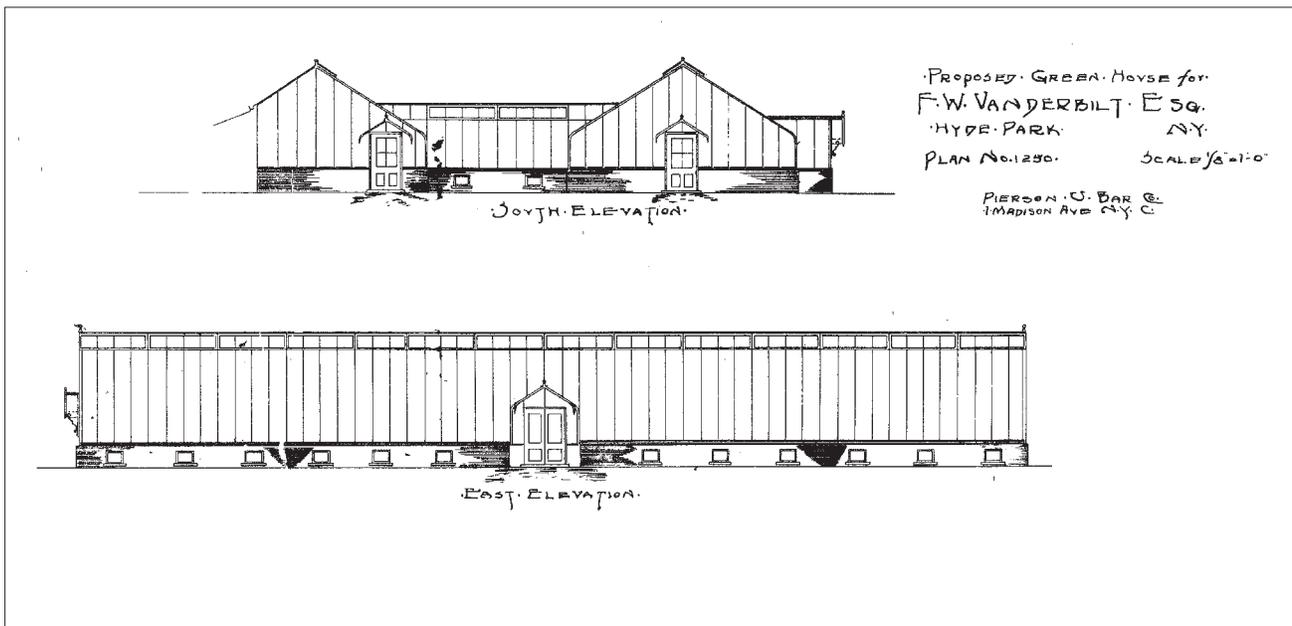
"Proposed Greenhouse for F. W. Vanderbilt," Plan No. 1250. Pierson U-Bar Co., Madison Avenue, New York City, no date, circa 1907 (VAMA, no. V-145).
